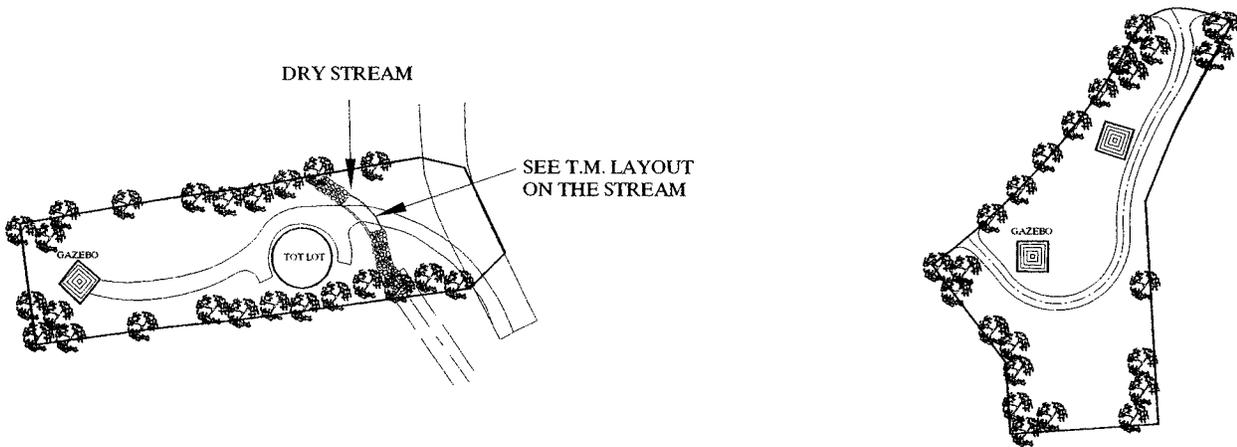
, Conceptual Site Plan for Private Park P1 & P2
